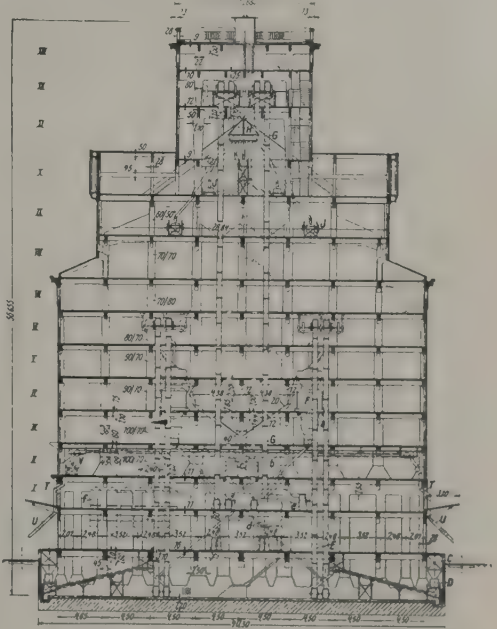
CROSS ELEVATION OF HEAD HOUSE
